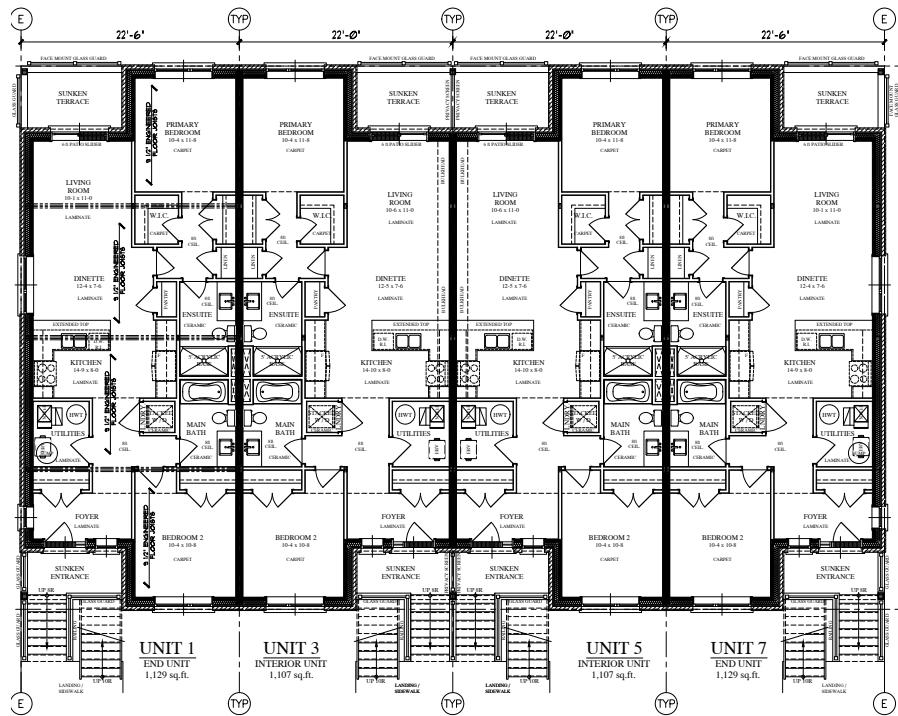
Stacked Bangalow Townhome Lower Level Floor Plans, prepared by Reids Heritage
